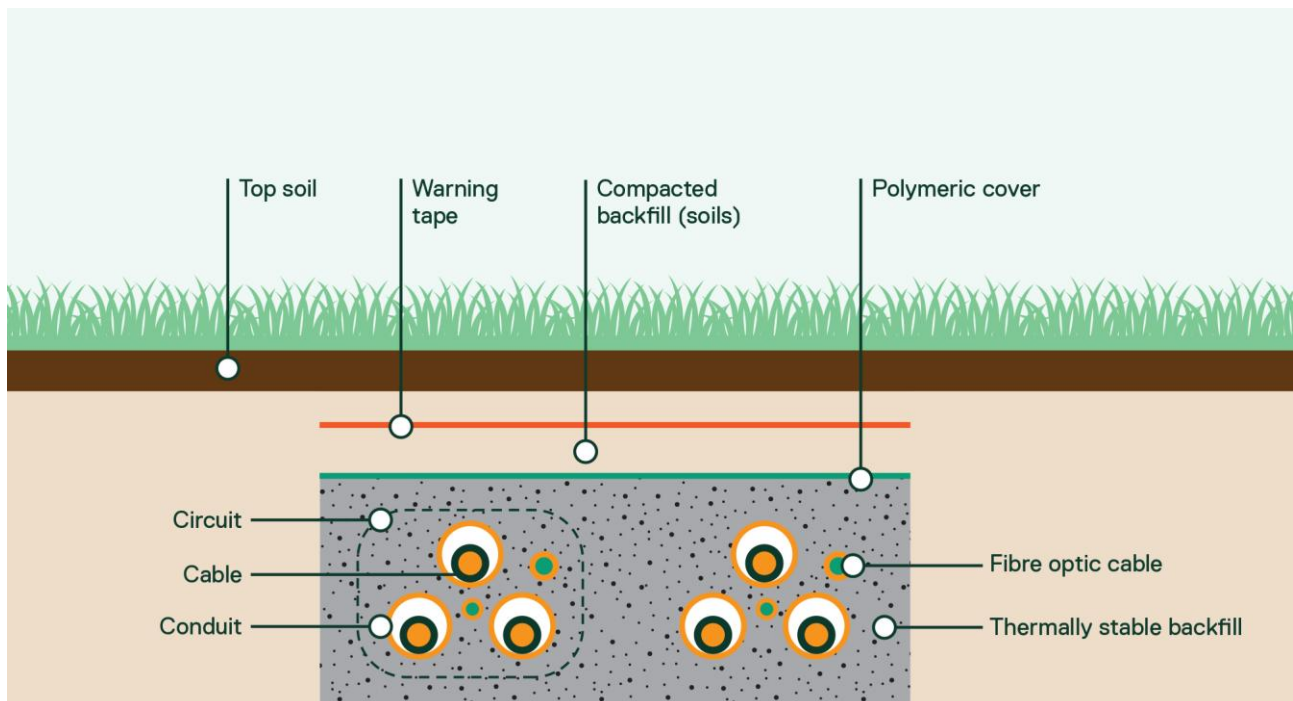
Example cable easement cross-section (eight circuits shown)
